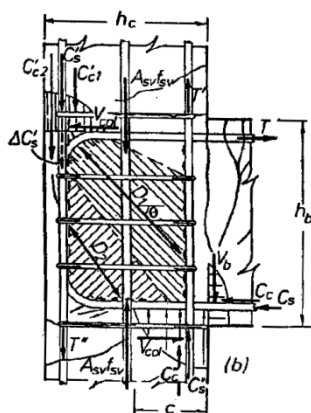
External actions on an exterior joint (Paulay and Priestley, 1992).
